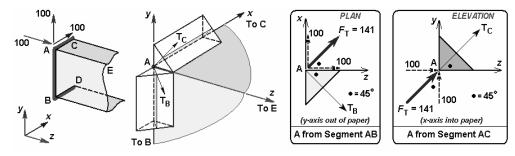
Channel Section Perpendicular Welds Example.
